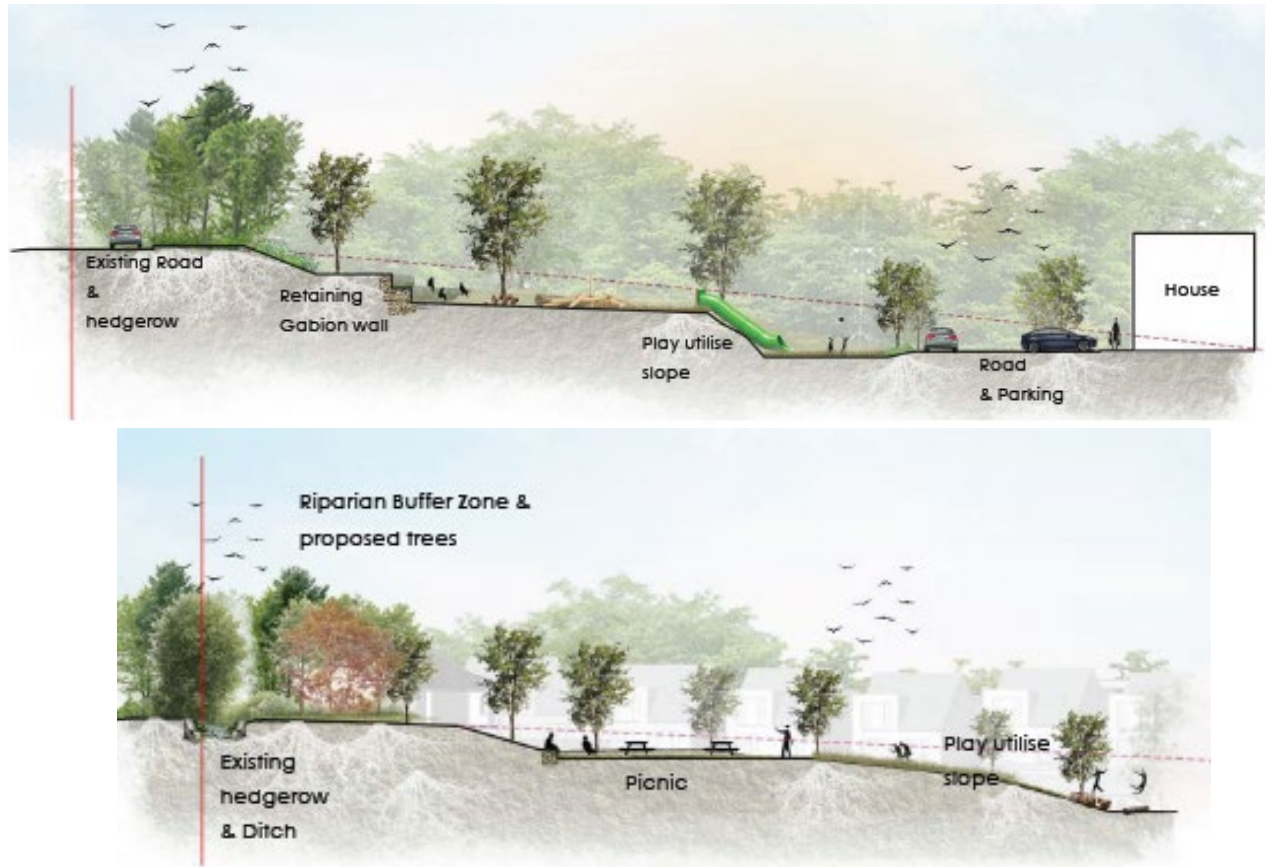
Sample sections through proposed Public Open Space No. 3
